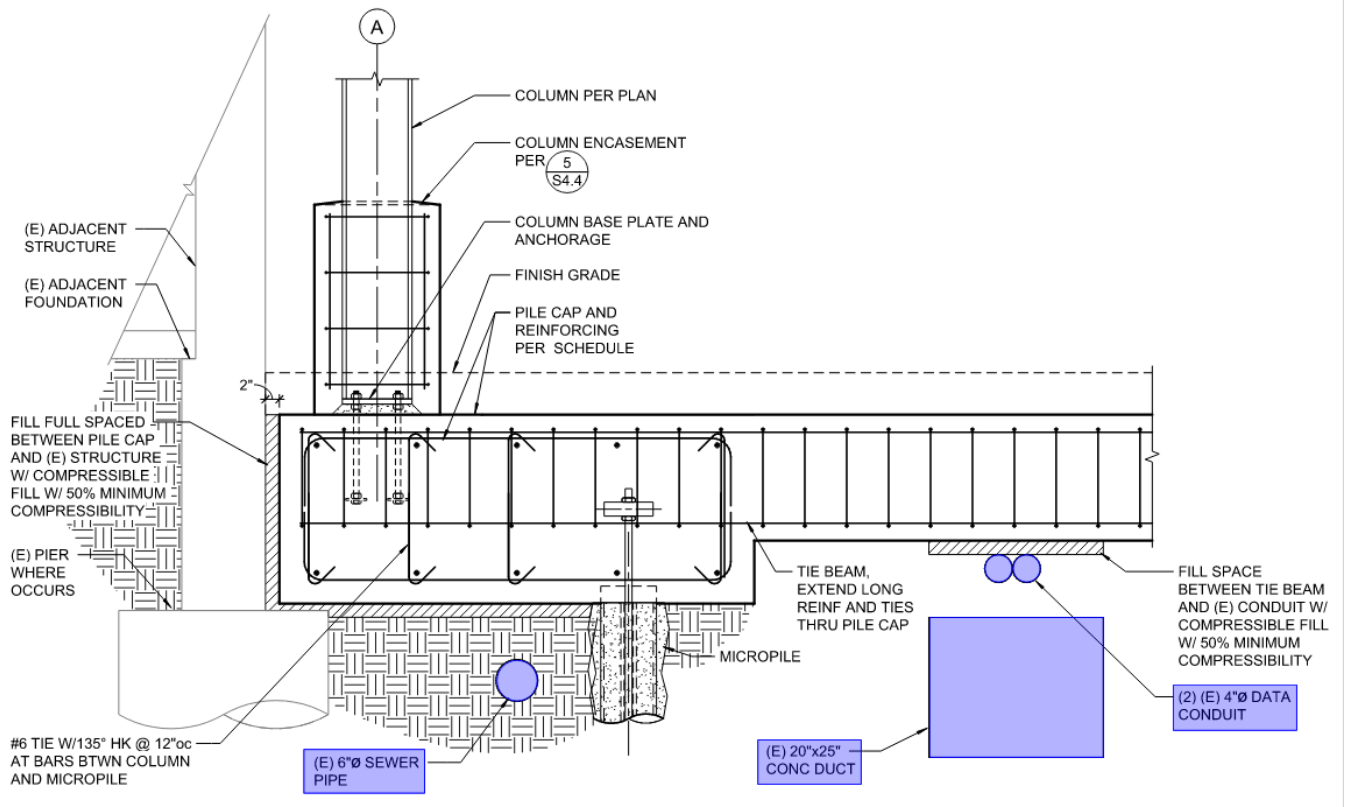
Existing Utilities Discovered Under a Proposed Pile Cap Location
